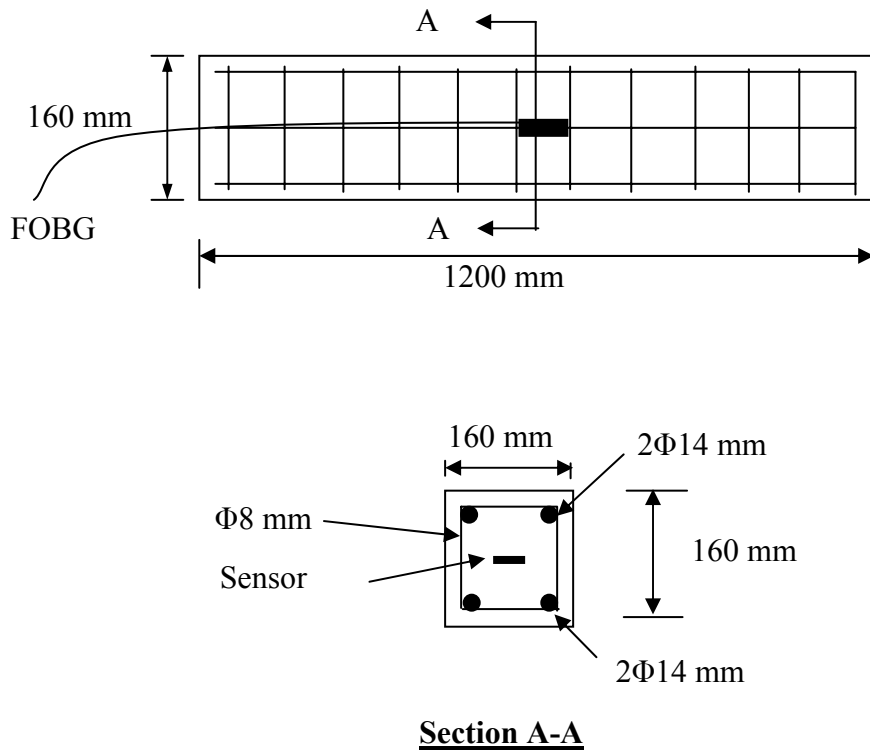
Details of the Tested Reinforced Concrete Beams.
